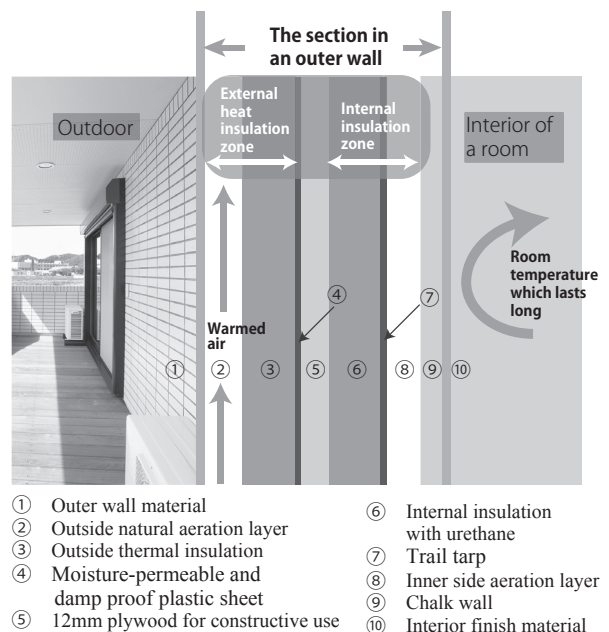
An outer wall sectional view "nijyutuuki-nijyudannetsu kouhou" (cross section)
